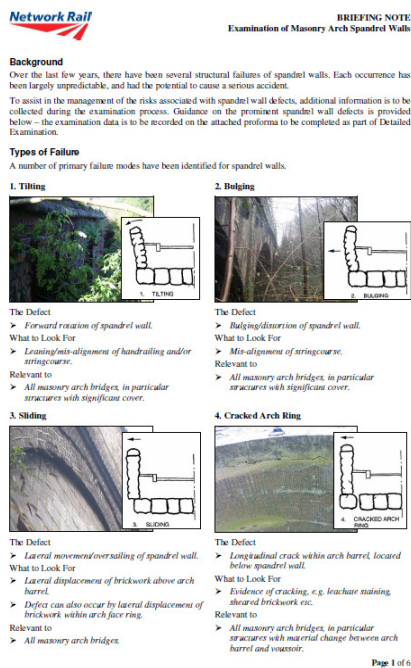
Briefing Note – The Examination of Masonry Arch Spandrel Walls
